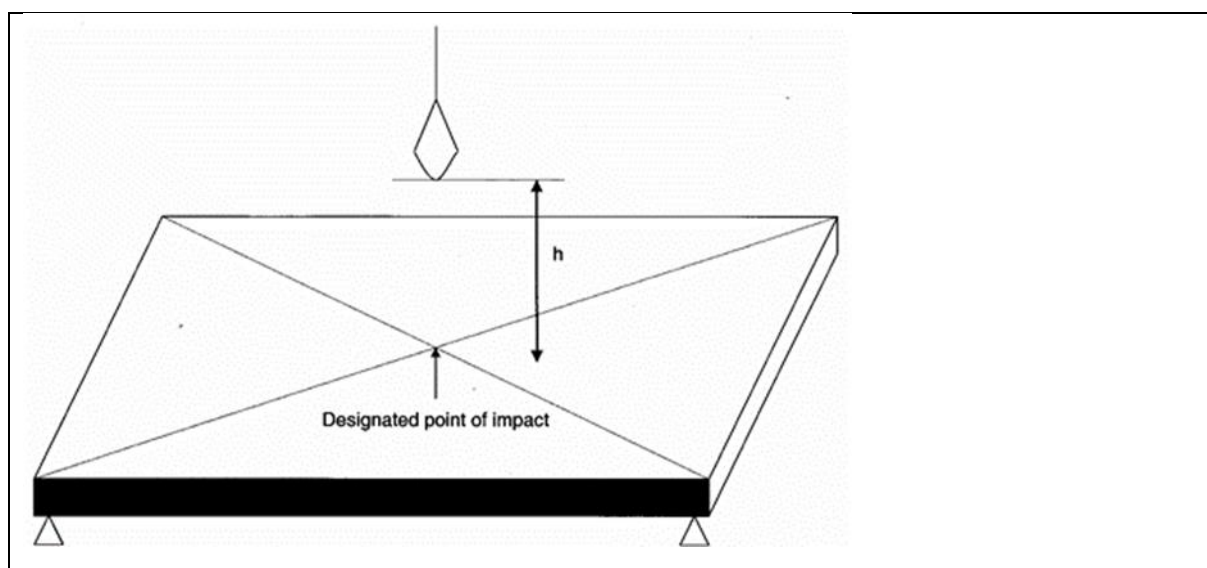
Vertical impact on horizontal test specimen h = drop height
